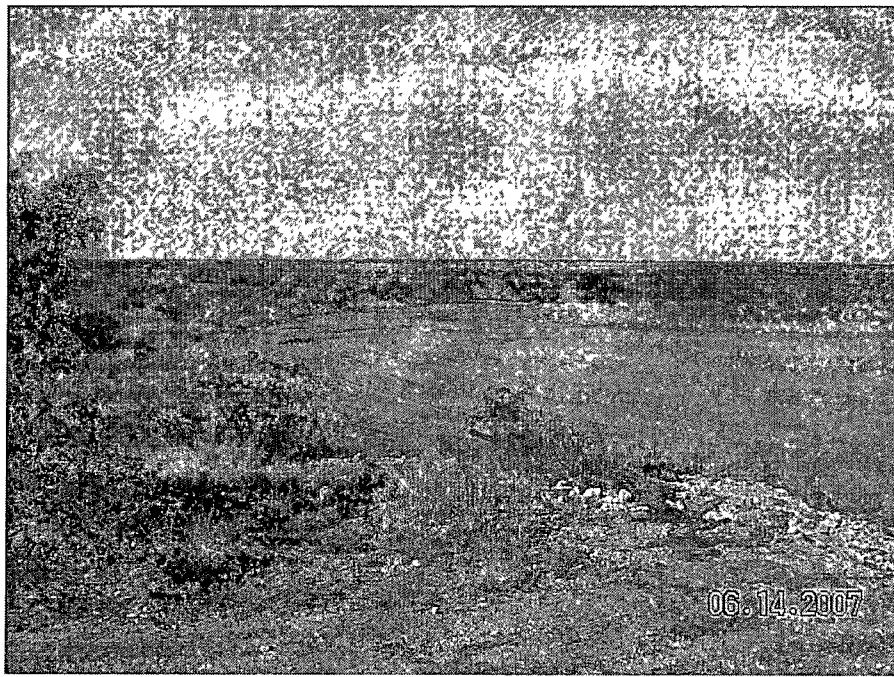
Looking westerly towards injection well excavation area after backfilling.
